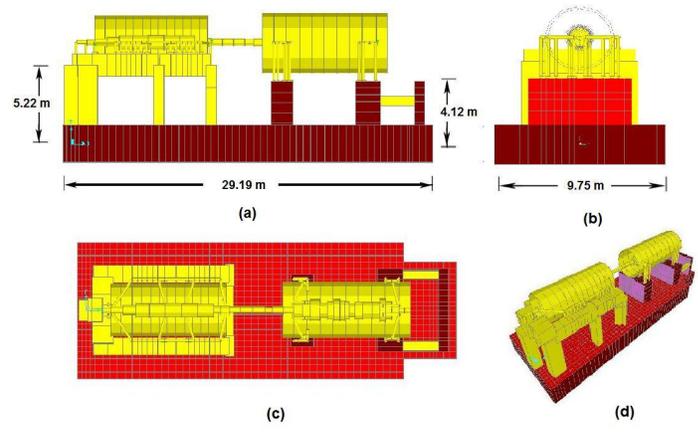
Overview of the foundation model for Configuration 1. (a) Longitudinal Elevation, (b) Transverse Elevation, (c) Plan view from above, (d) 3D Perspective
